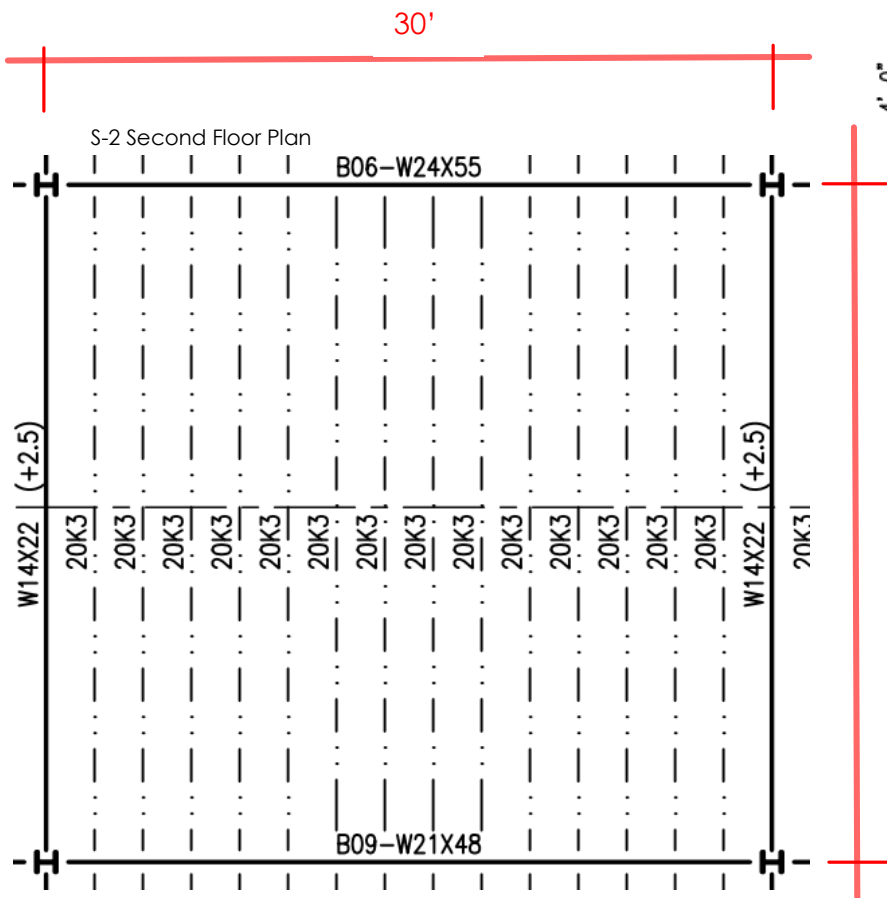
A typical 30ft. by 28ft. bay framed with joists spanning the north-south direction. A typical floor plan is shown in full on the following page
